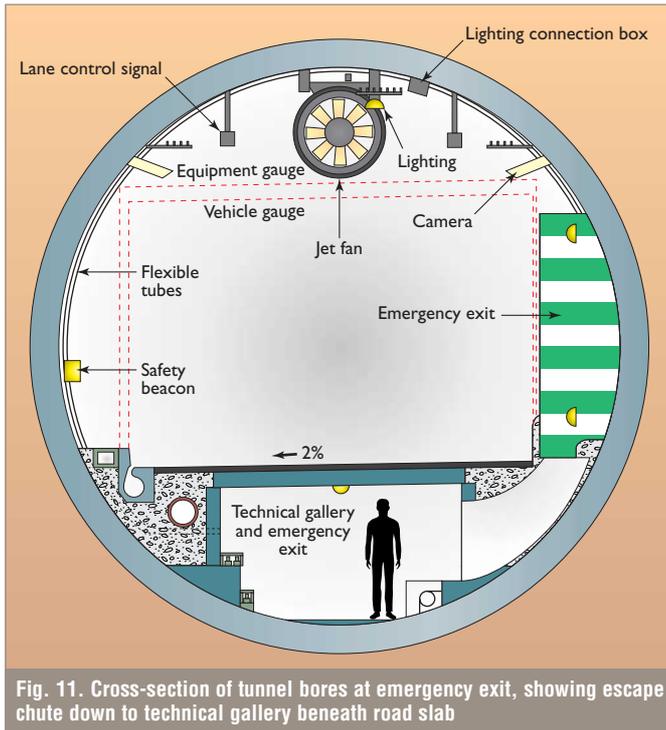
Cross-section of tunnel bores at emergency exit, showing escape chute down to technical gallery beneath road slab
